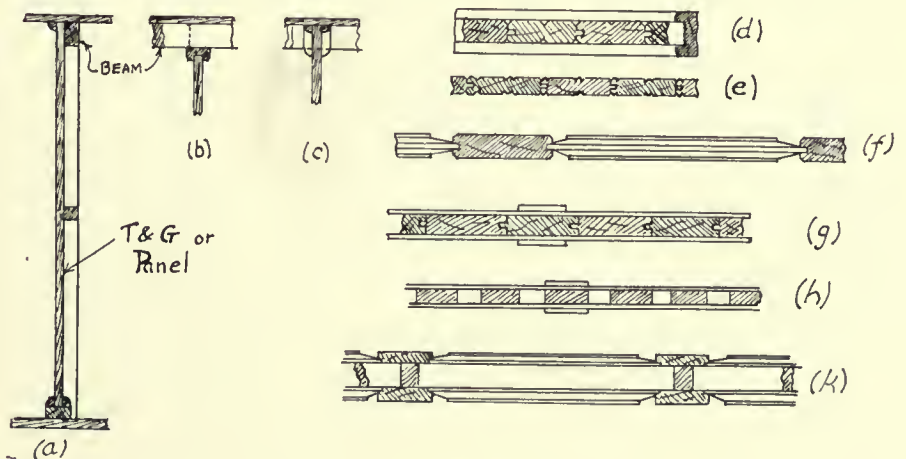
CROSS SECTIONS OF VARIOUS MINOR BULKHEADS FOR CABINS, ETC.
